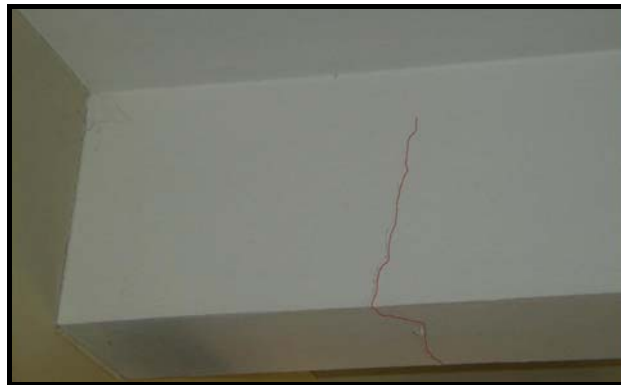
Flexural crack in the ground floor beam-B18 (Bolu)
